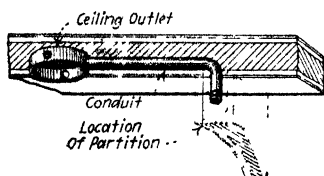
Horizontal run of conduit from ceiling outlet turned down out of floor slab toward the switch-box location.
